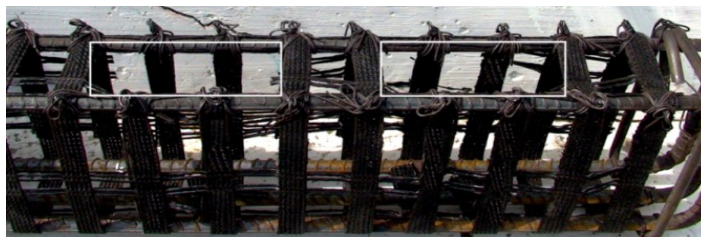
Typical geo-grid confinement details in Type-C beam
